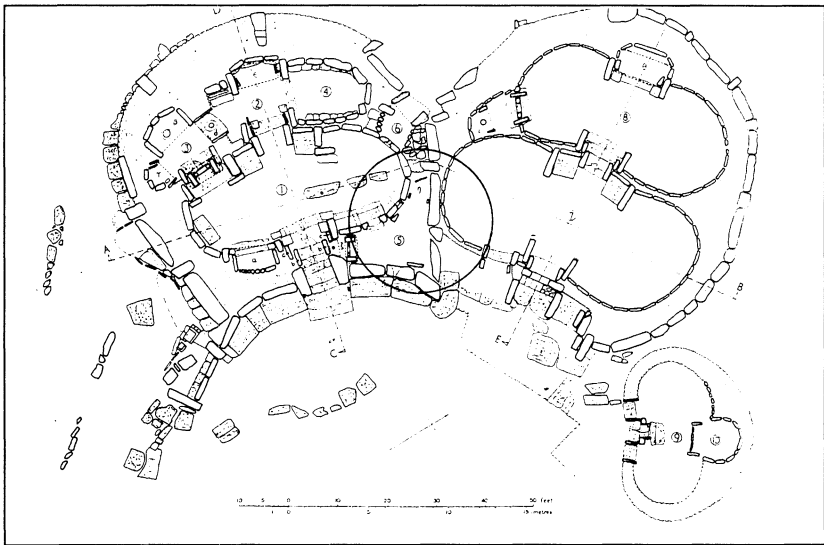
Plan of the Mnajdra Temples- Evans¹
